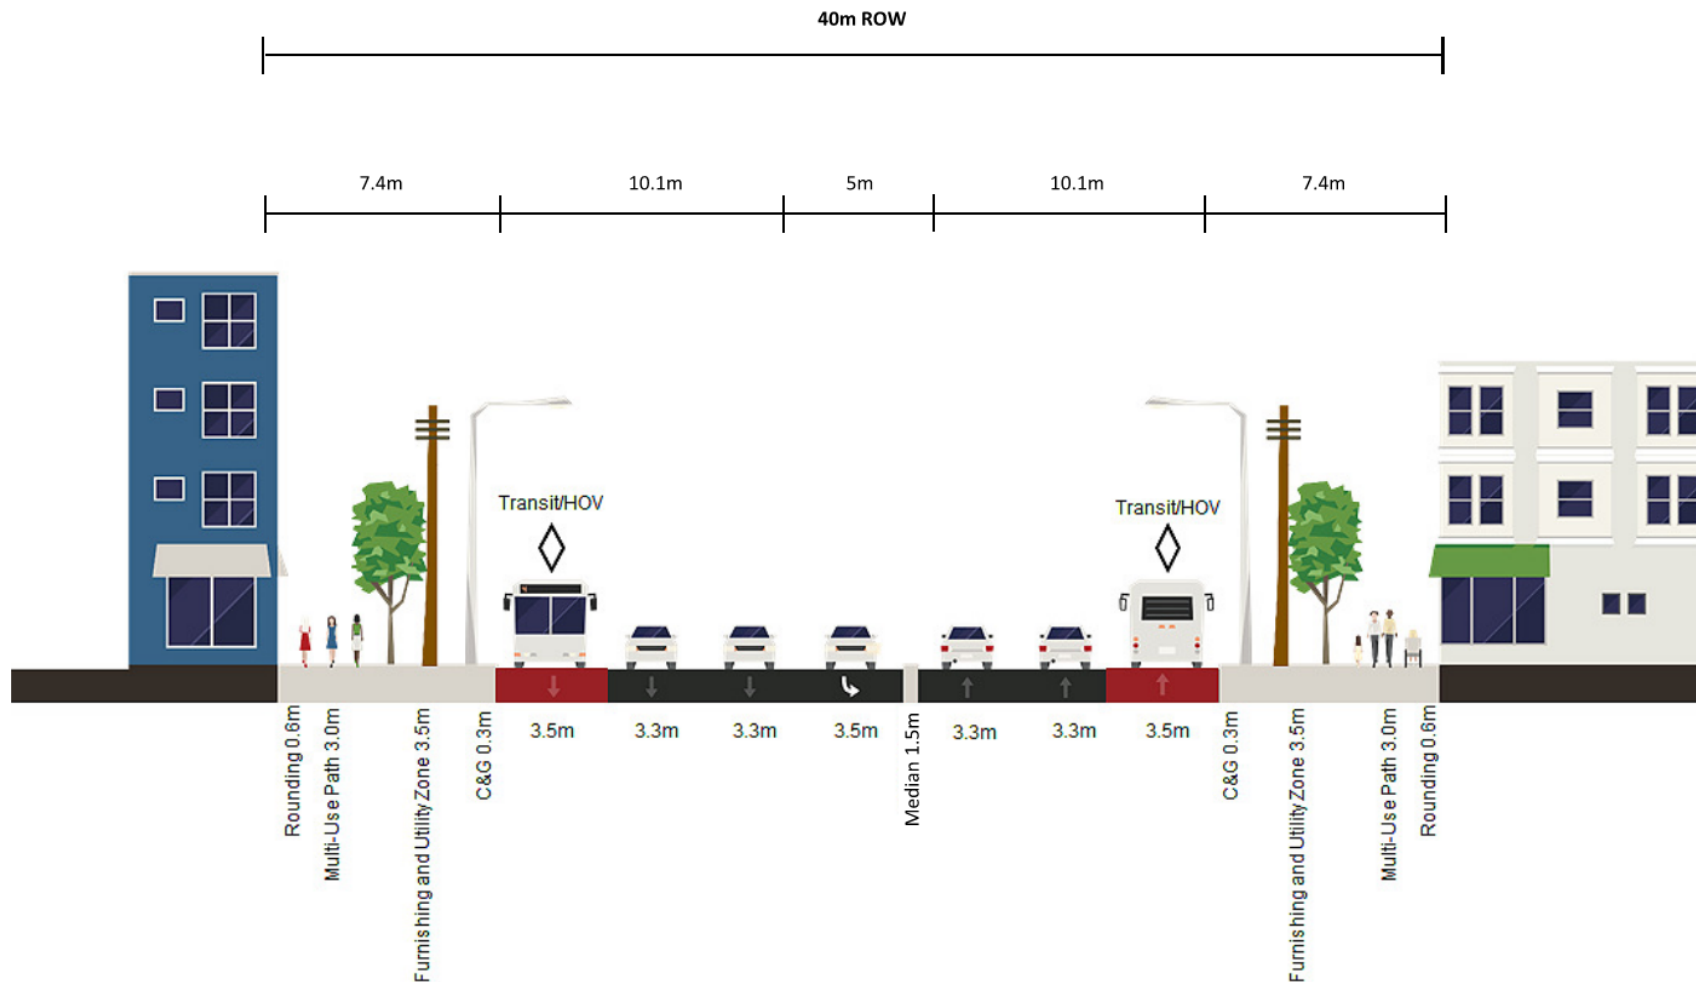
Intersection Typical Section – Six Lanes for Transit / HOV with AT facilities
